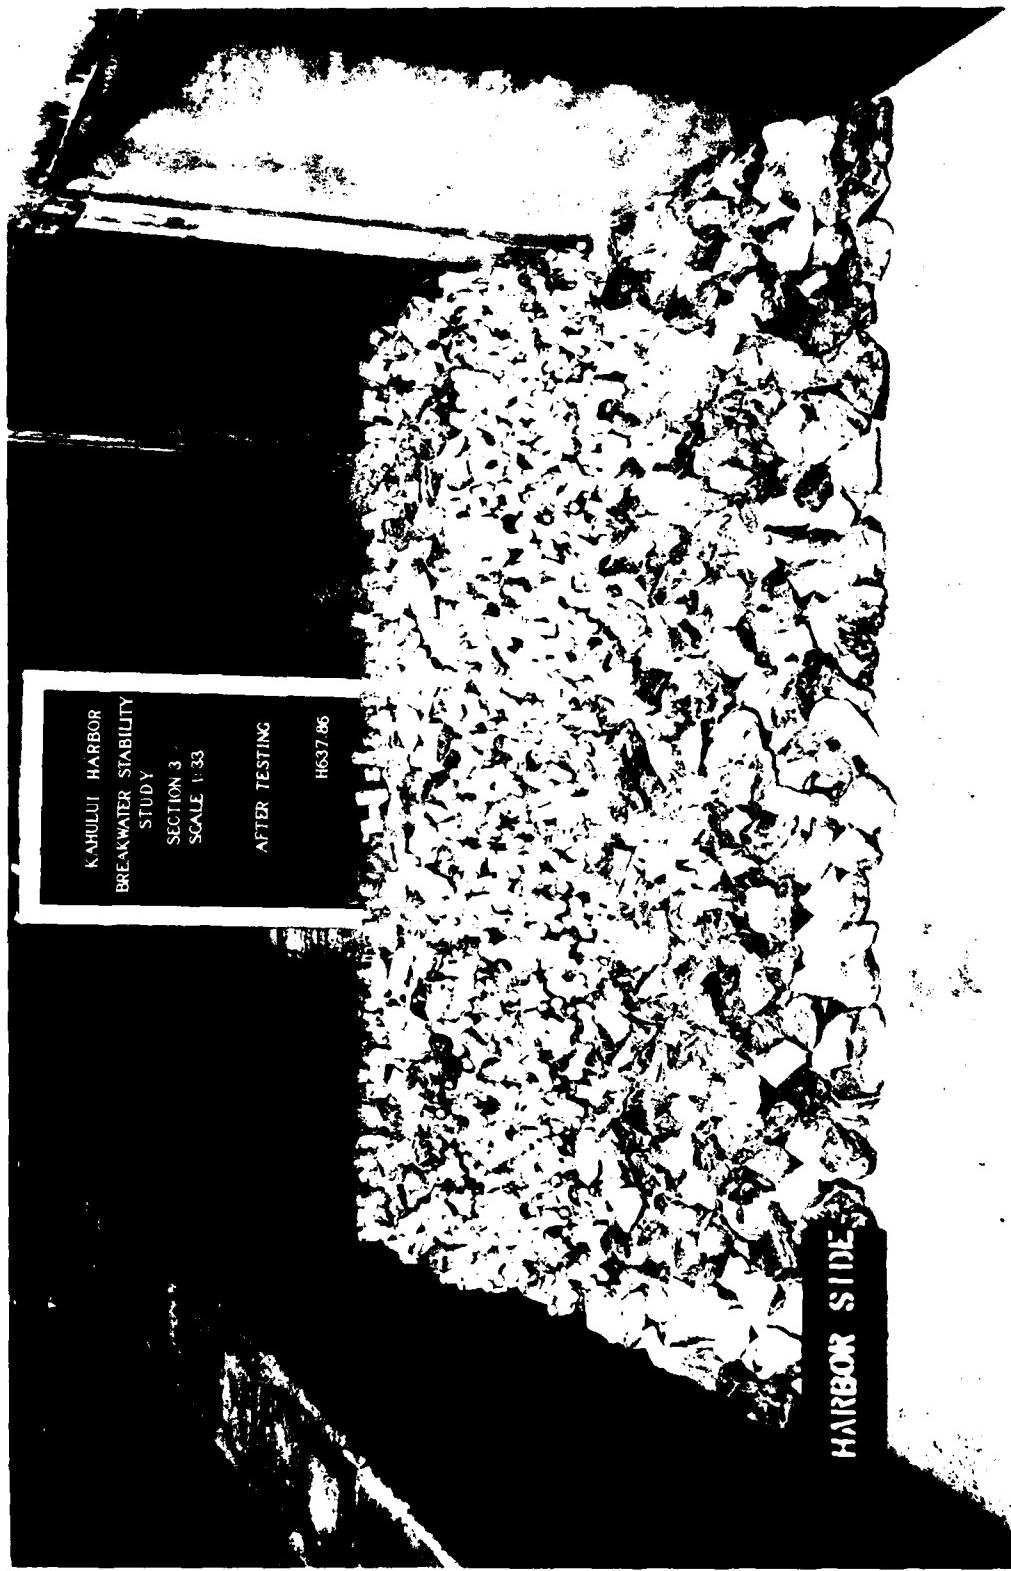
Harbor-side view of Plan 2 after testing, 1st test
